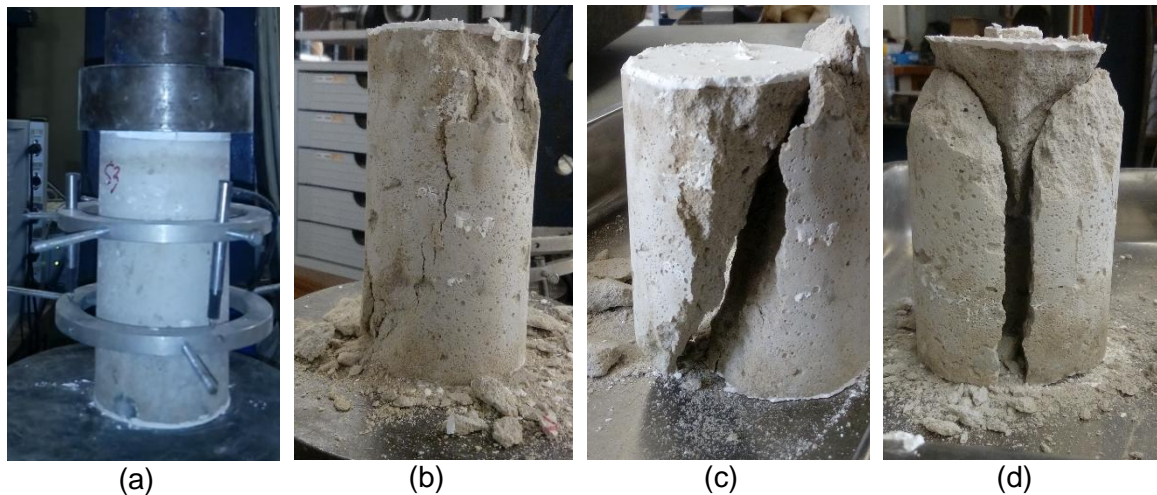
Uniaxial compression test for cement mortar M1 (a) Setting of the specimen in the testing machine; (b) formation of a diagonal cracks and palling of the specimen surface from top and bottom; (c) separation with main vertical/diagonal crack and (d) symmetric separation of specimen with 3 vertical cracks
